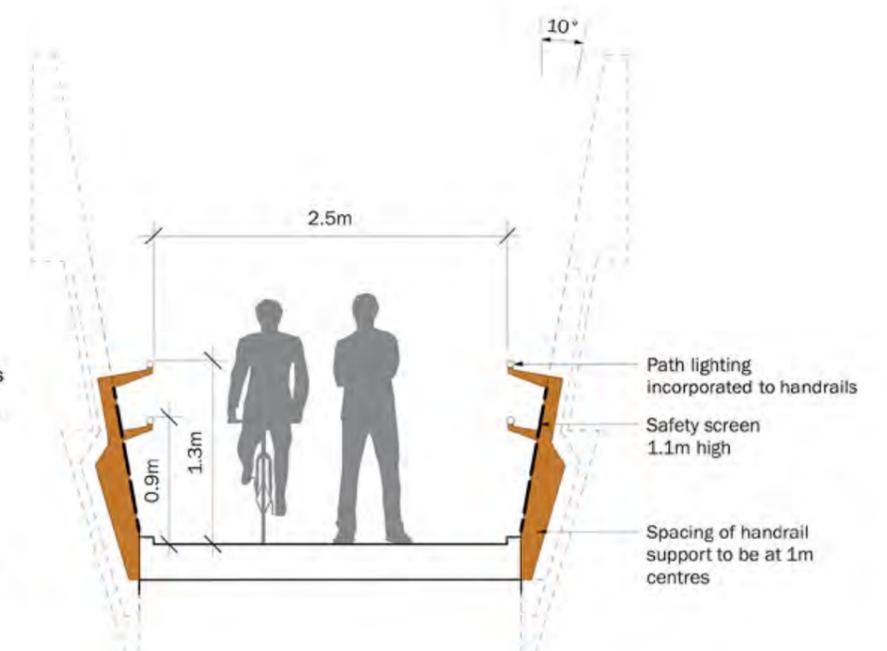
Section through the new ramp of the proposed Northfields pedestrian bridge extension - BR04 (Scale 1:200)
